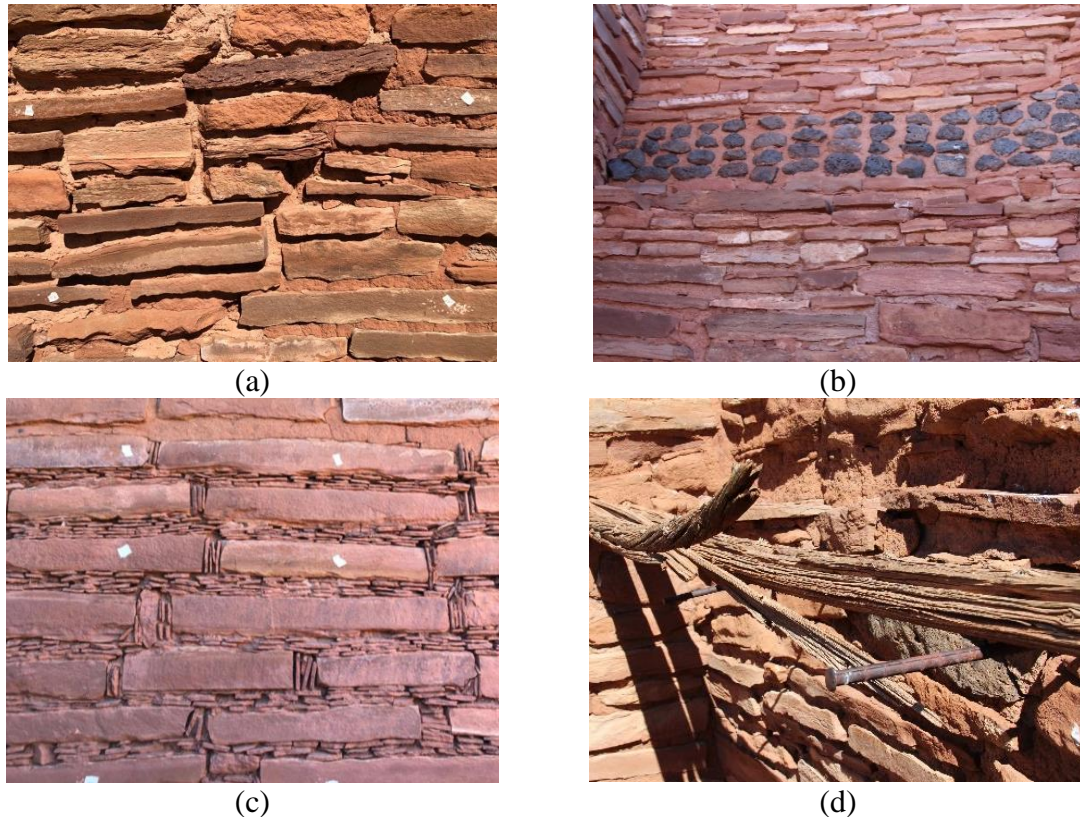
Materials and building techniques at the Wupatki Pueblo: (a) Moenkopi stones; (b) basalt pebbles; (c) chinking; (d) floor timber beam.
